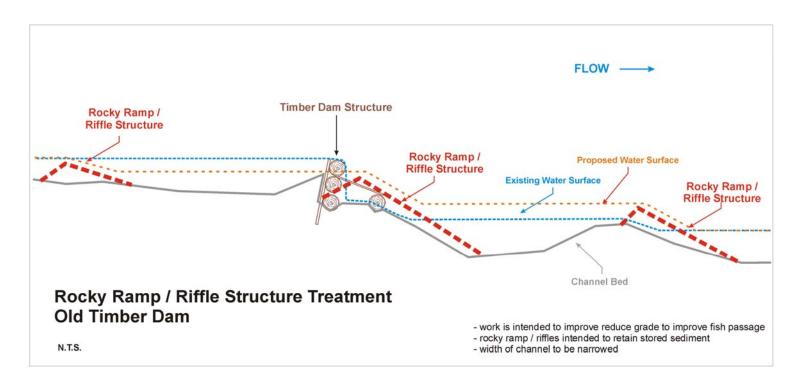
Proposed Rocky Ramp / Riffle Structure channel works to replace existing timber dam.
